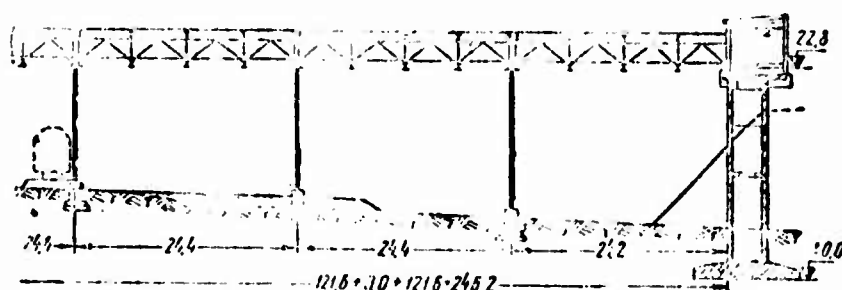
Diagram of a conveyor gallery with trusses having a span of 24 m and sectional ferroconcrete capping and flooring slabs with nominal lengths of 6 m.
